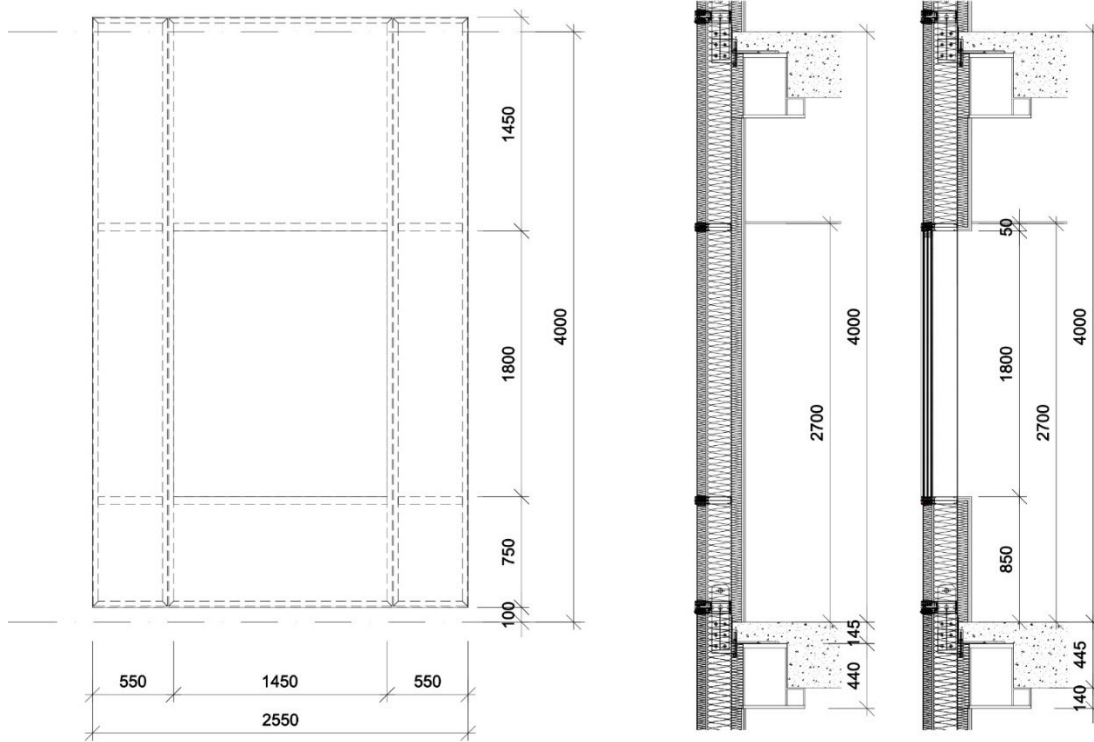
The elevation (left) and sections (right) of the aluminium frame panel used in this study.
